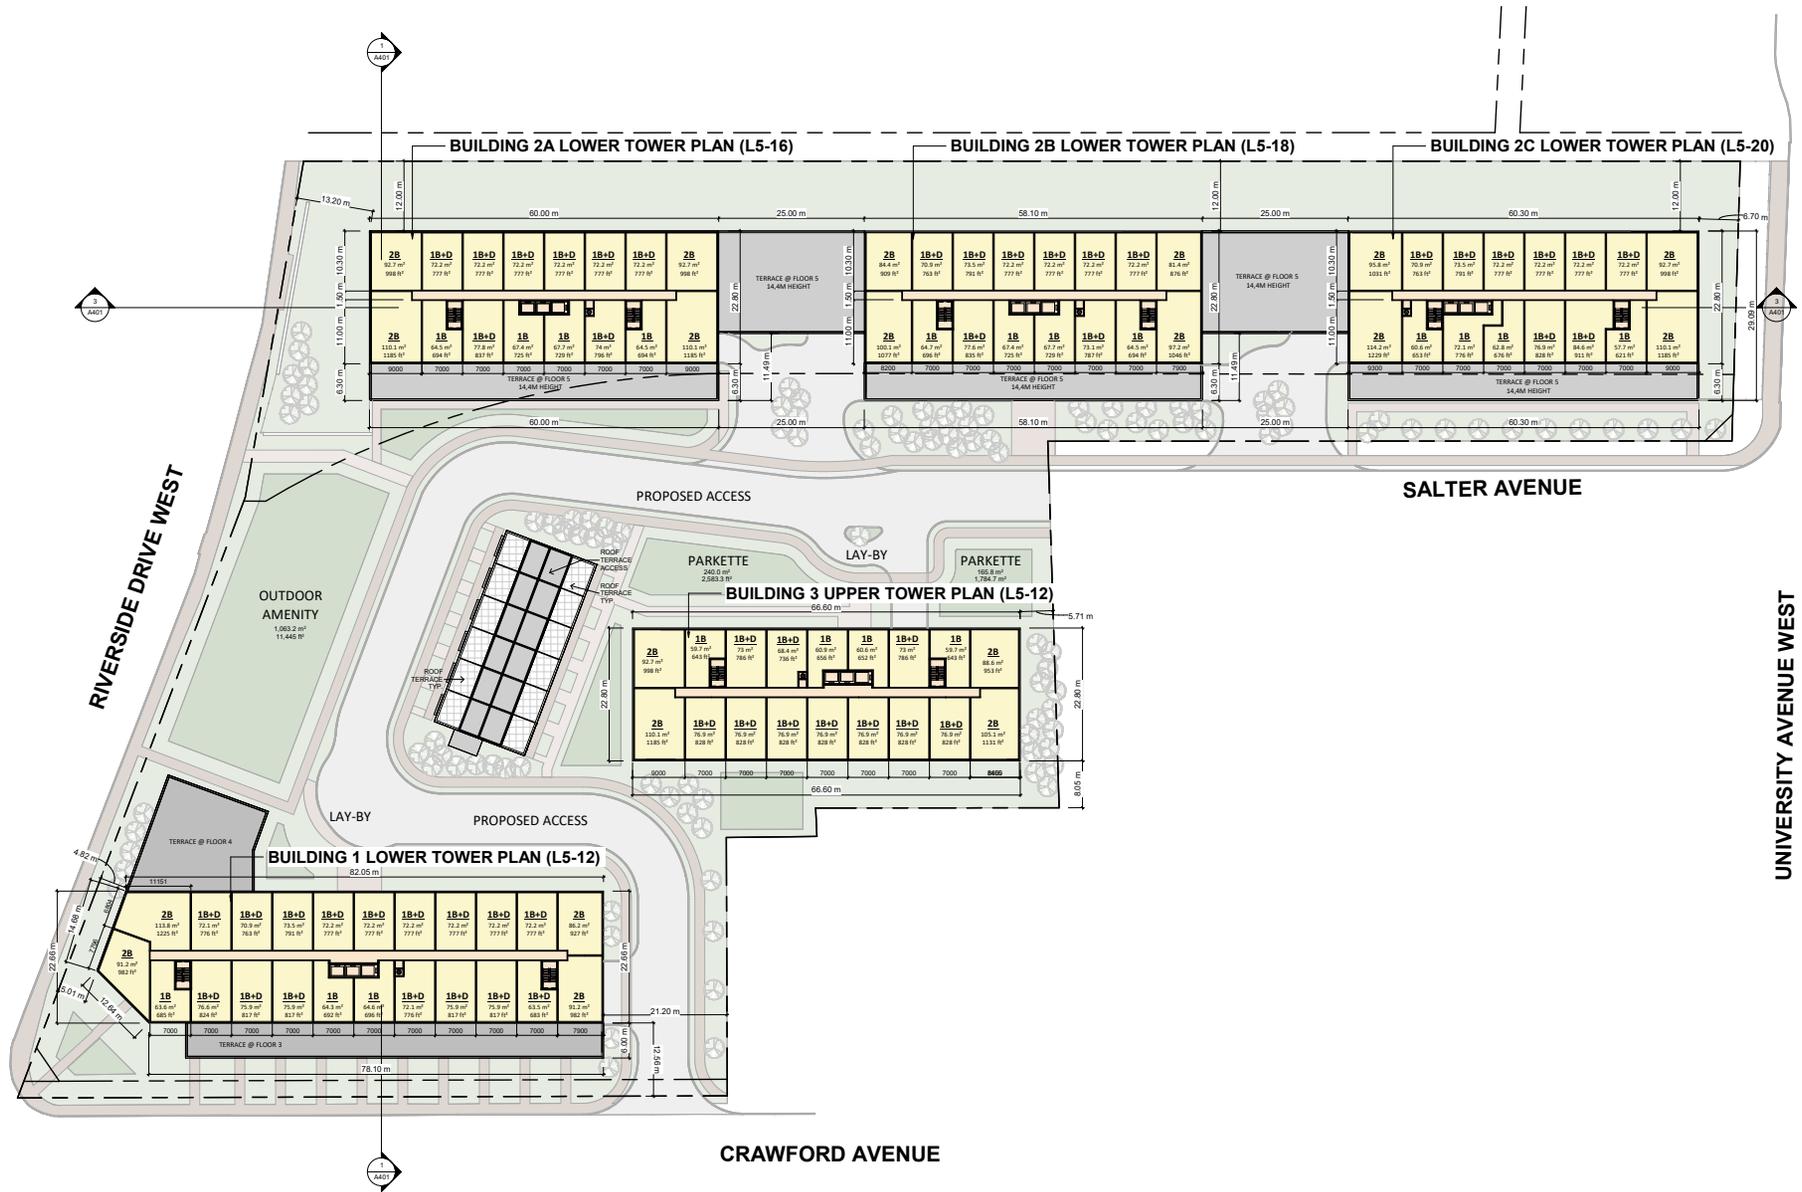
Typical Lower Tower Floor Plans, prepared by Turner Fleischer
